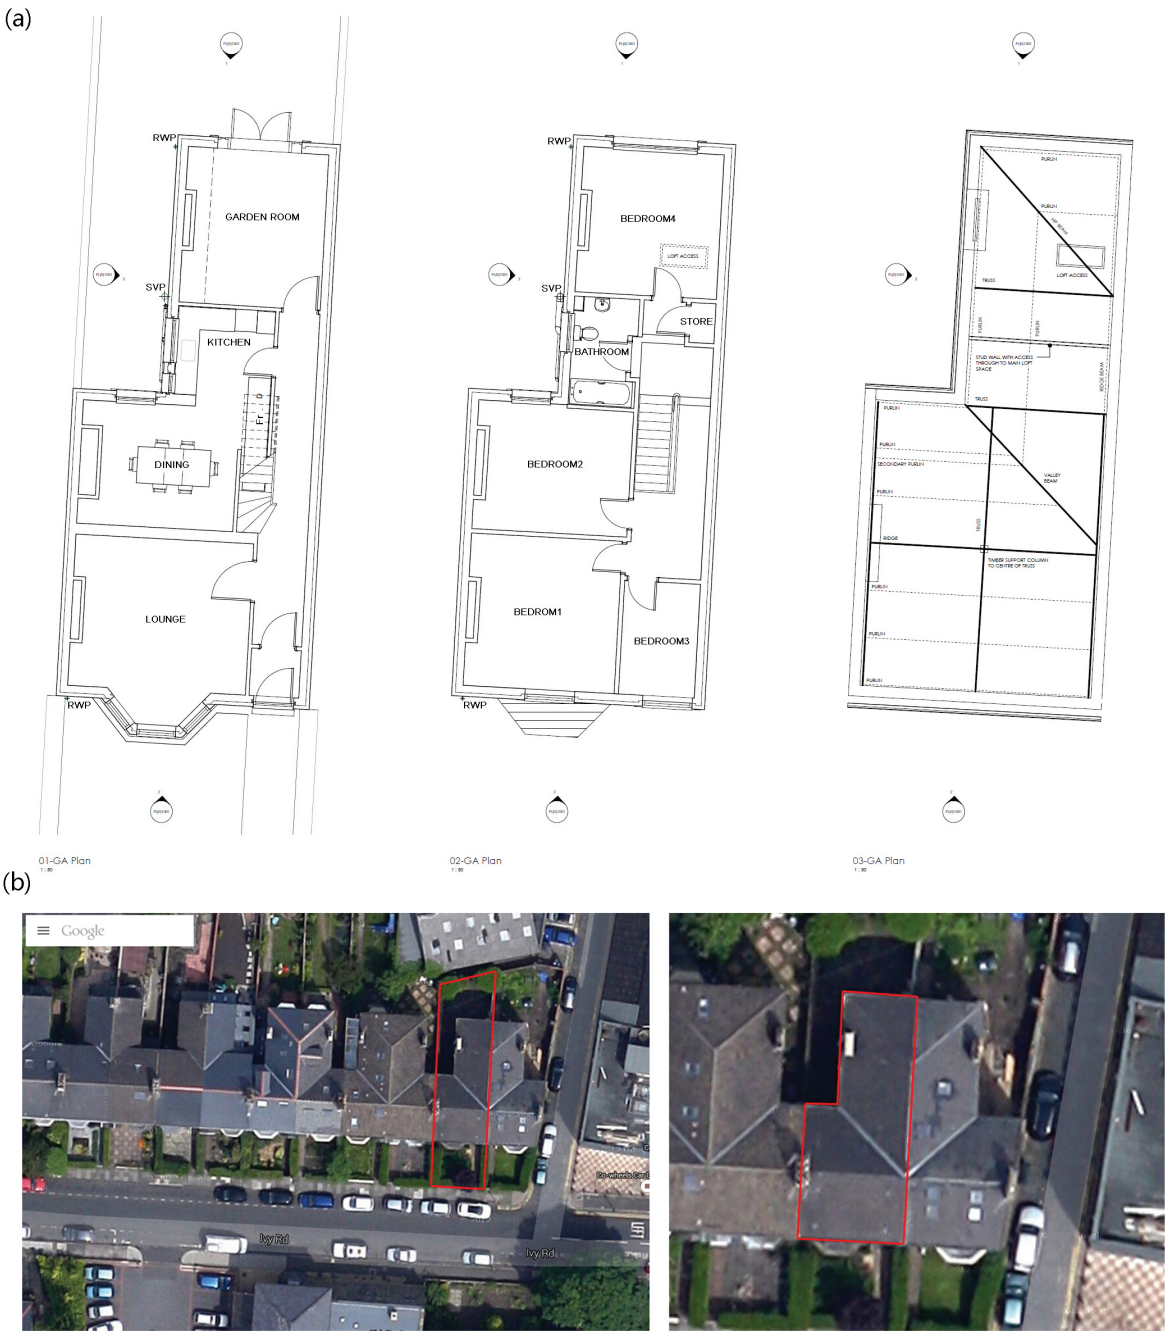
Case study house: (a) Surveyed plan drawings by an architect (b) House areal view on Google®
